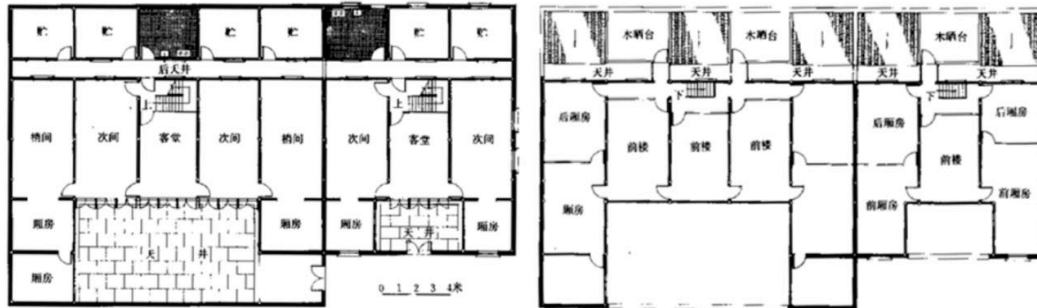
Early Shikumen neighborhood plan, ground (left) and first (right) floor
